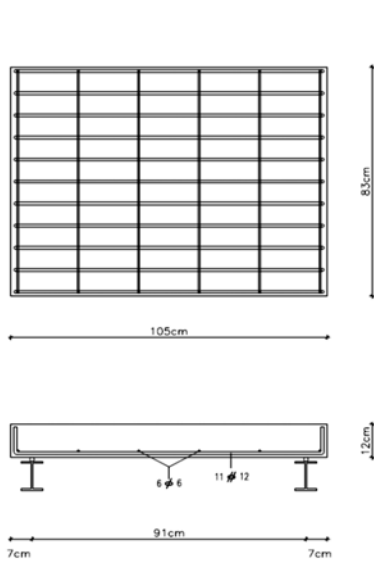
Typical dimensions and reinforcement of monolithic slab (M1)
